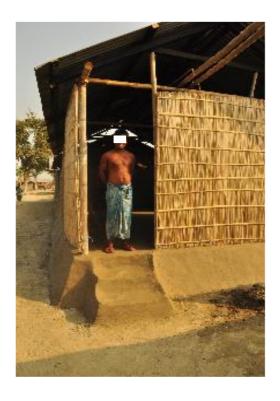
20: Shelters constructed on raised plinth (Image: Boramari, 29-01-13)
